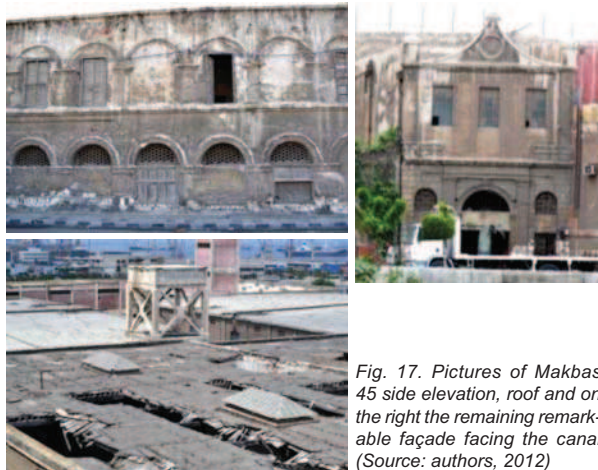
Pictures of Makbas 45 side elevation, roof and on the right the remaining remarkable façade facing the canal (Source: authors, 2012)
